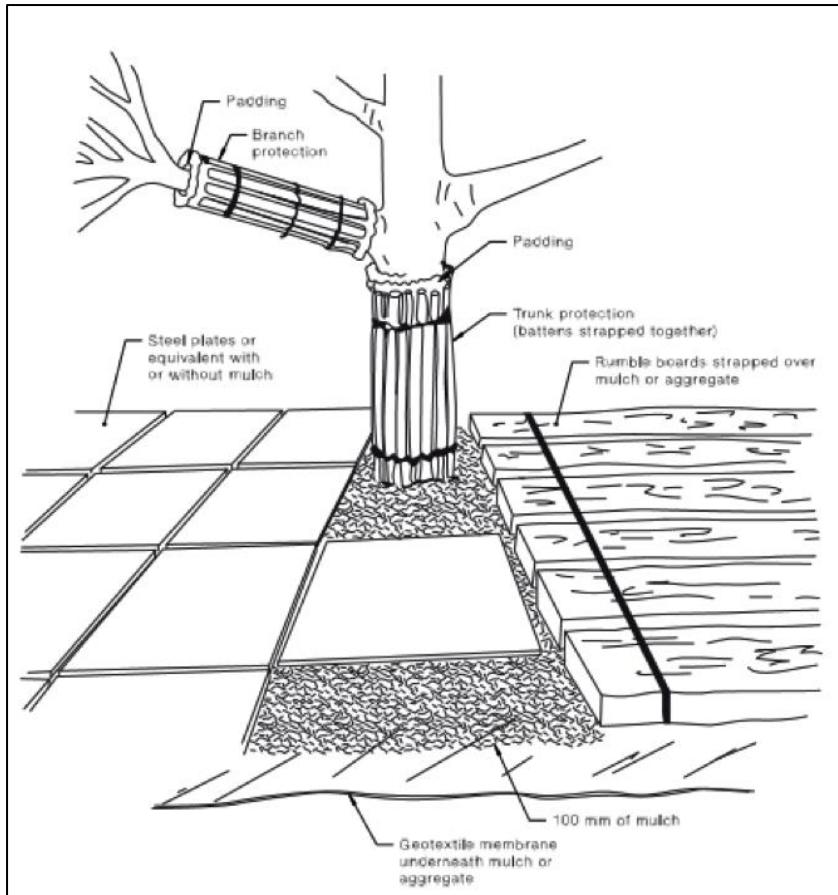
TRUNK, BRANCH AND GROUND PROTECTION
